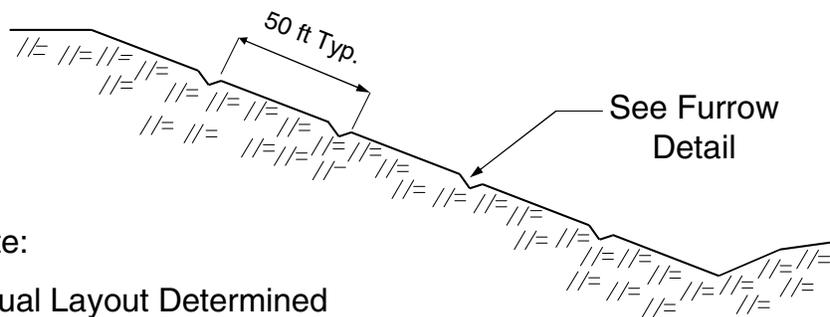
Slope Rounding, Stepping, Terracing, and Contouring
